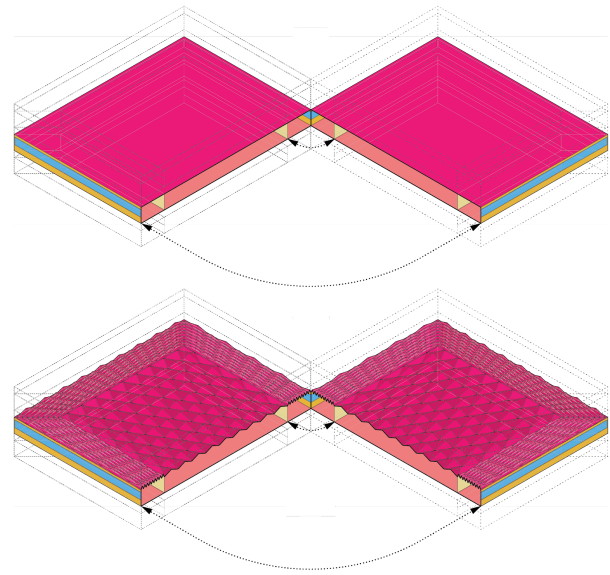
Building energy modeling geometry unfolded in section. The second floor zones are highlighted showing the a) flat ITM ceiling surface, and b) shaped ITM ceiling surface in magenta.
